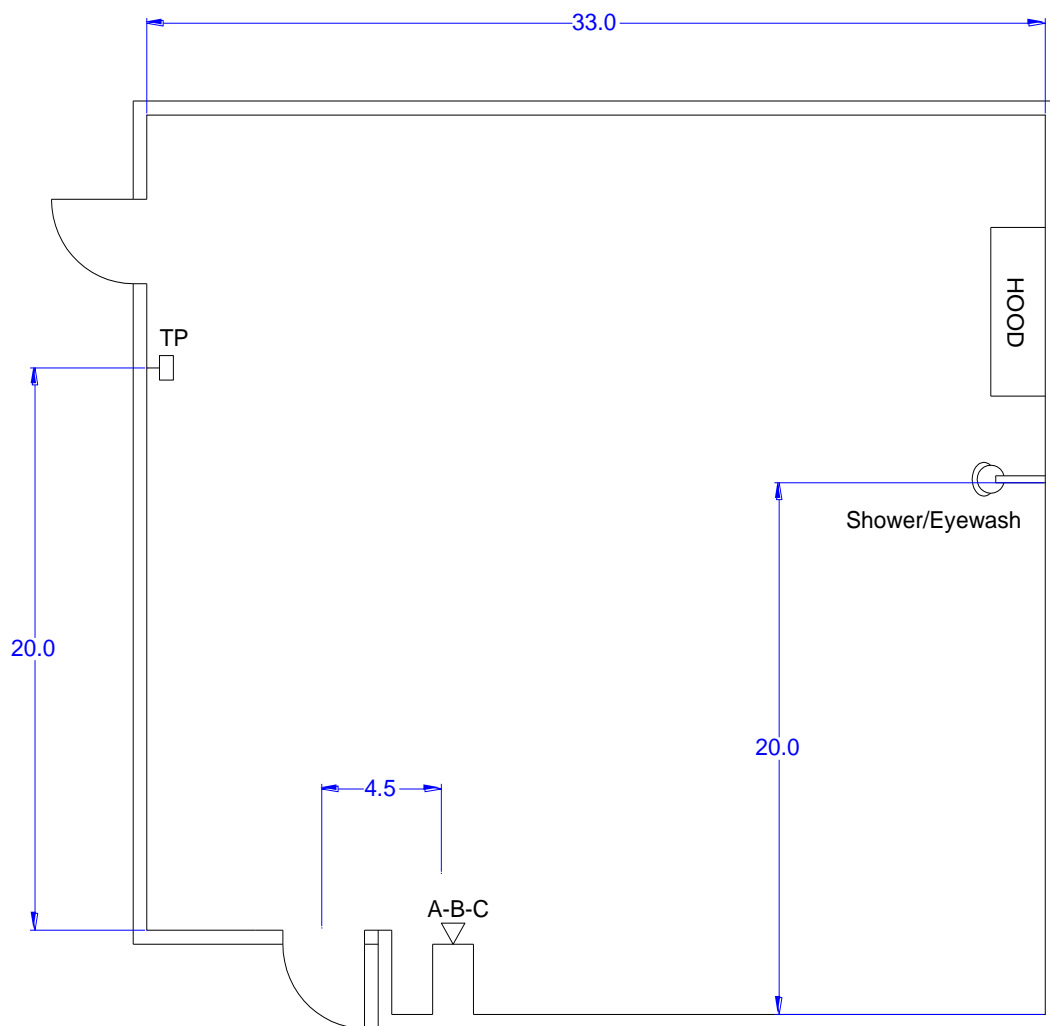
Layout of rooms EC 3625 showing location of University safety equipment.
